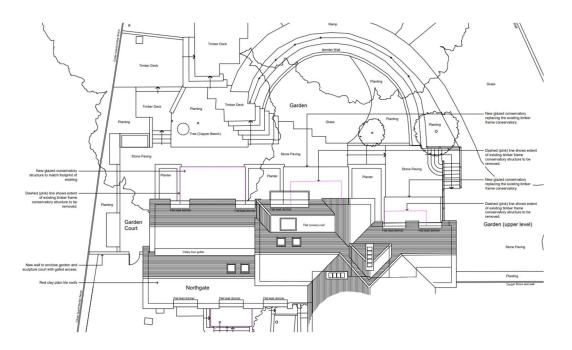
Proposed Site Plan at 'Northgate' neighbouring The Site
